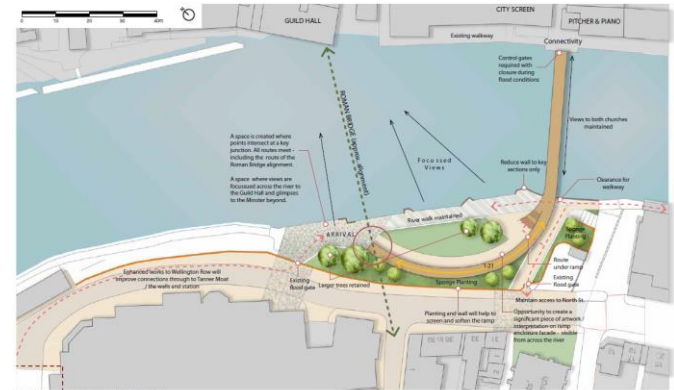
Proposed site and landscape plan for Alignment Option 1
